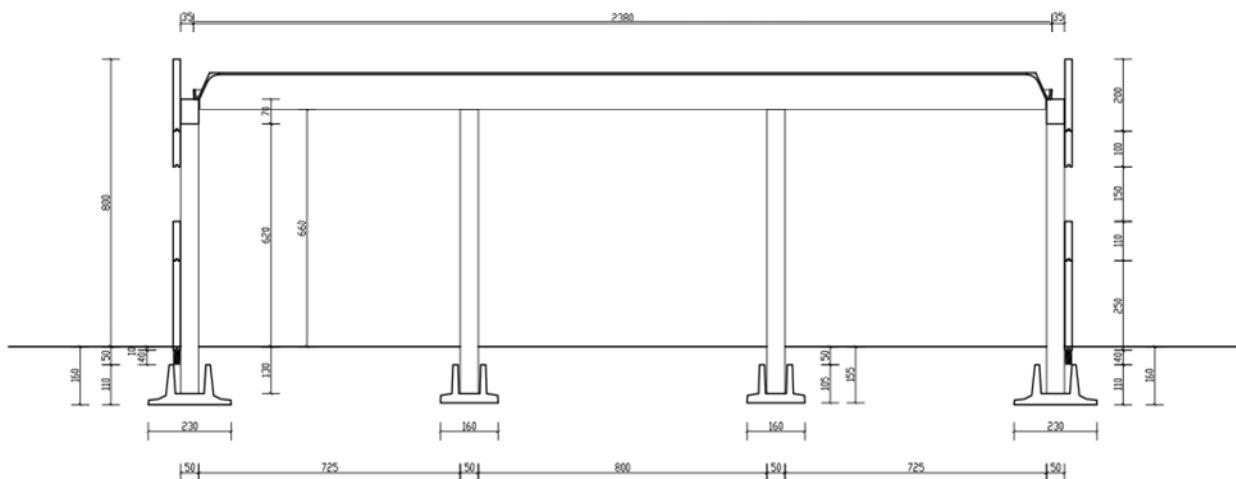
Section view of an existing industrial building in the examined area, with shallow foundations.
